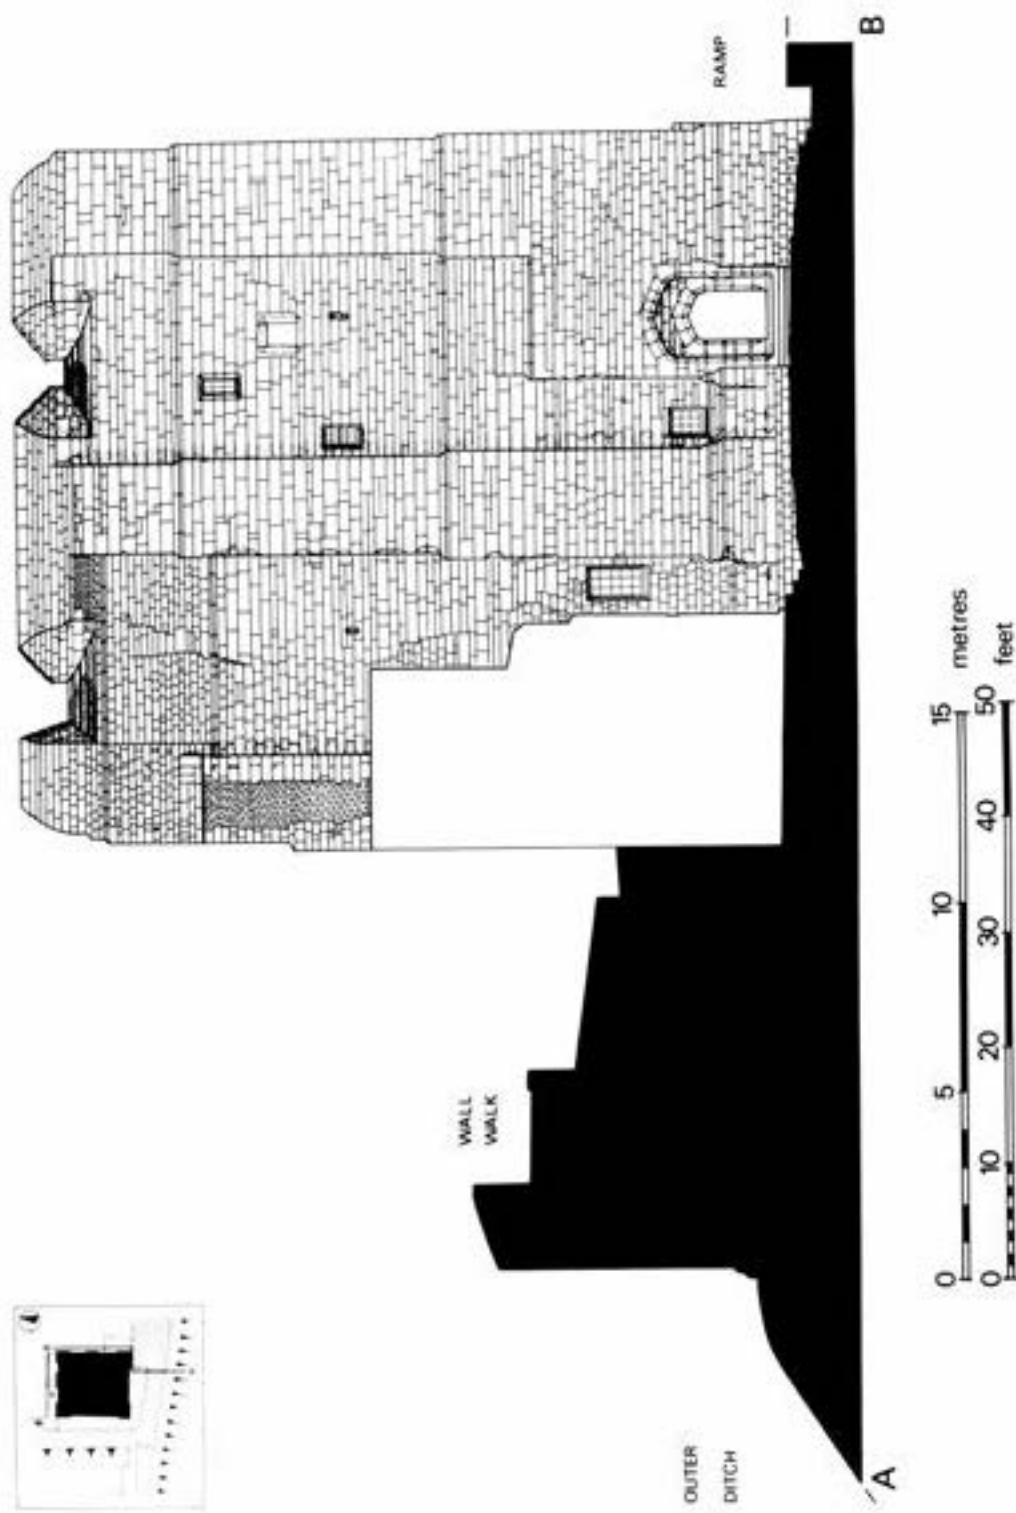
The keep; external elevation of the east wall showing the relationship with the south curtain wall
